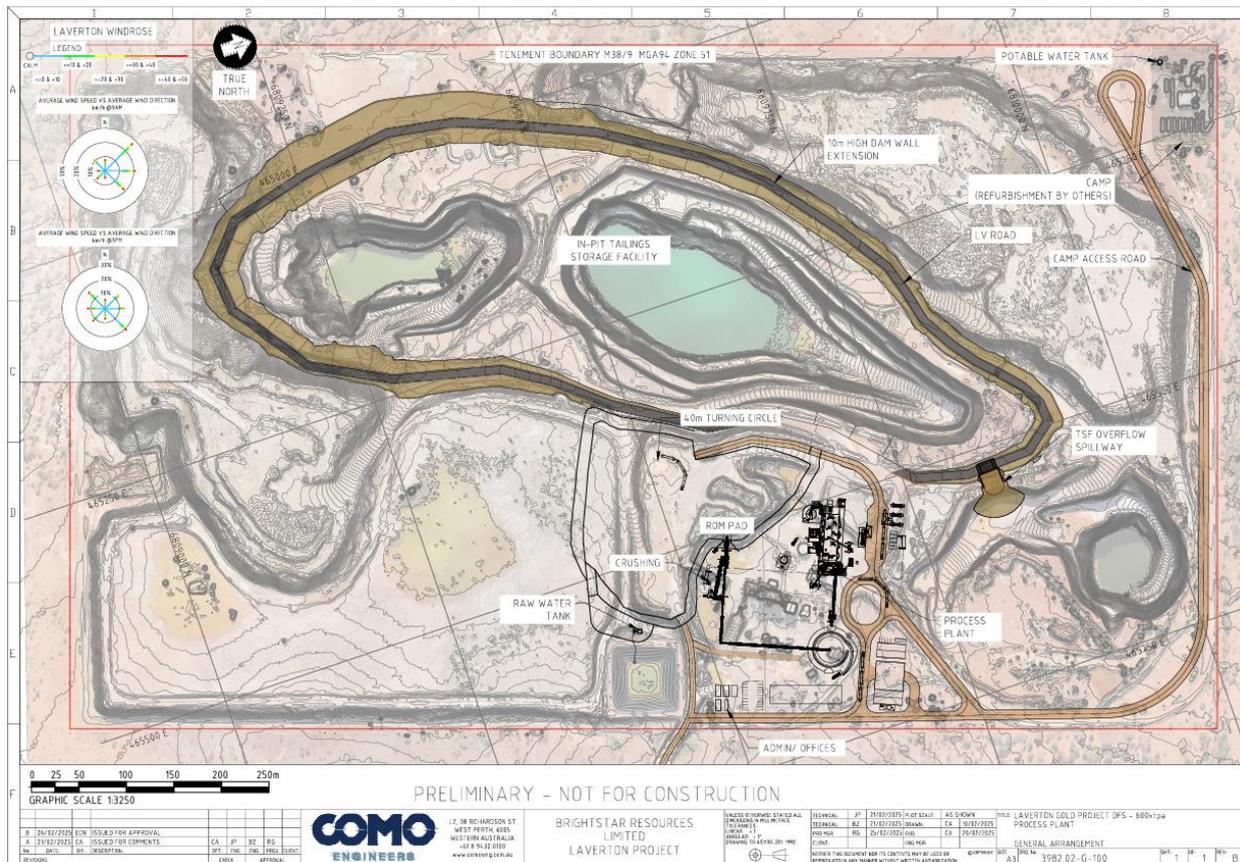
Beta Plant with TSF Wall Embankment displayed (Como, 2025)
